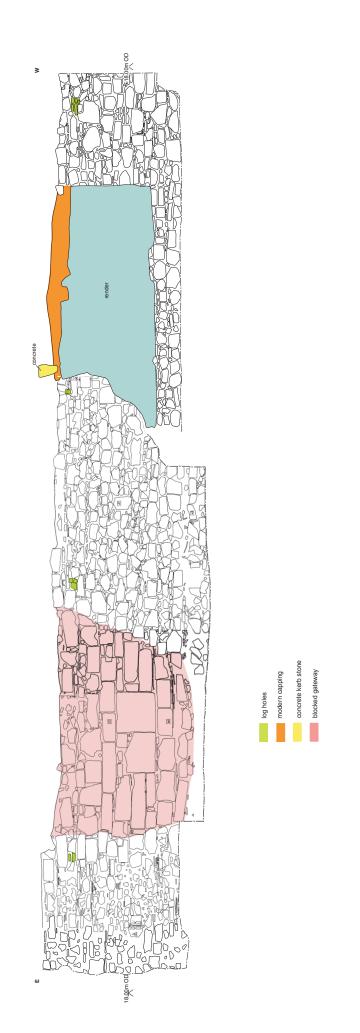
North facing elevation showing both the section of wall recorded in 1989 and the newly exposed section
